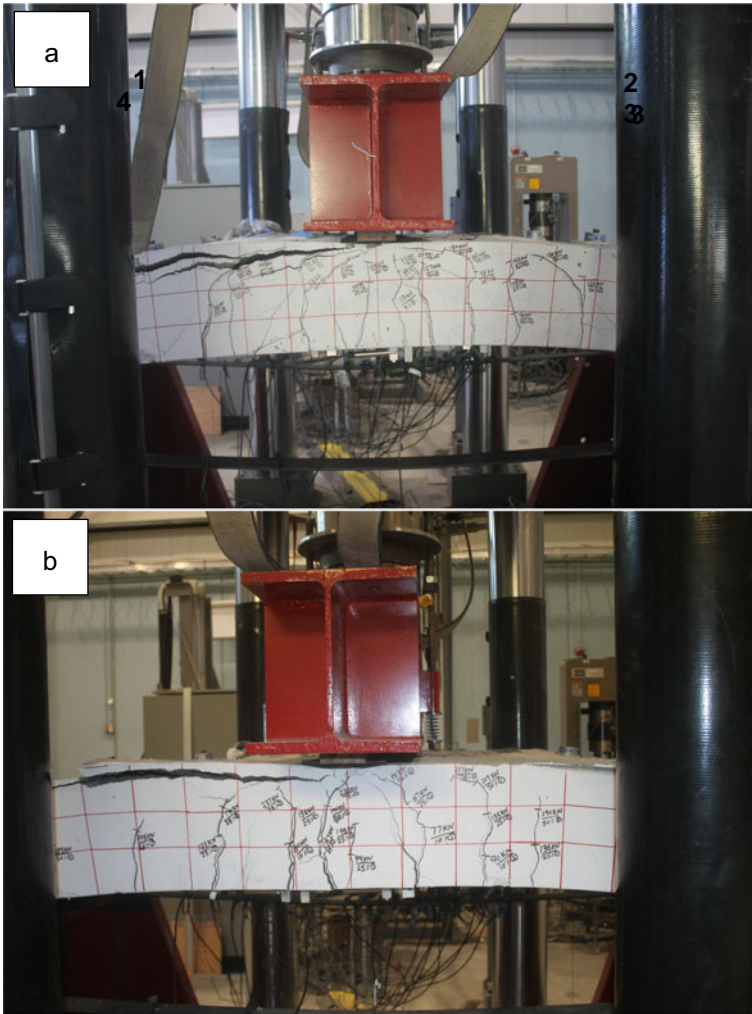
Failure mode: (a) GFRP specimen, (b) steel specimen
